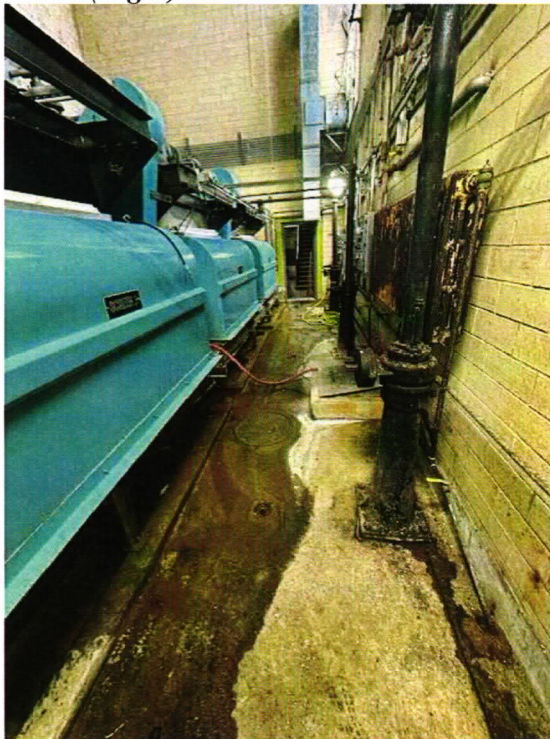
(Left): Screen Room on River Side looking North towards garage opening
